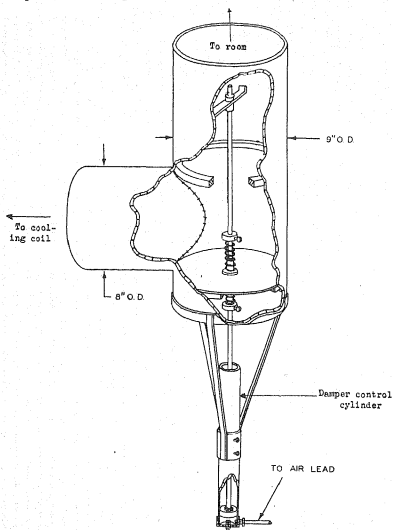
Cutaway view of damper used for isolating storage room from refrigerating equipment during the defrosting cycle.
